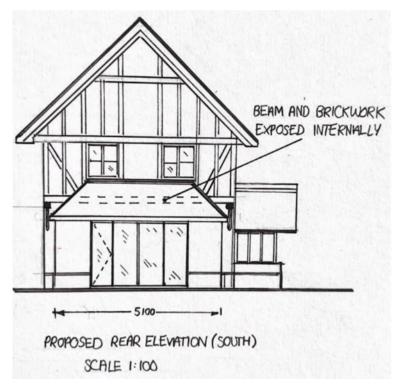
Proposed rear elevation of the 2022 pre-application extension
